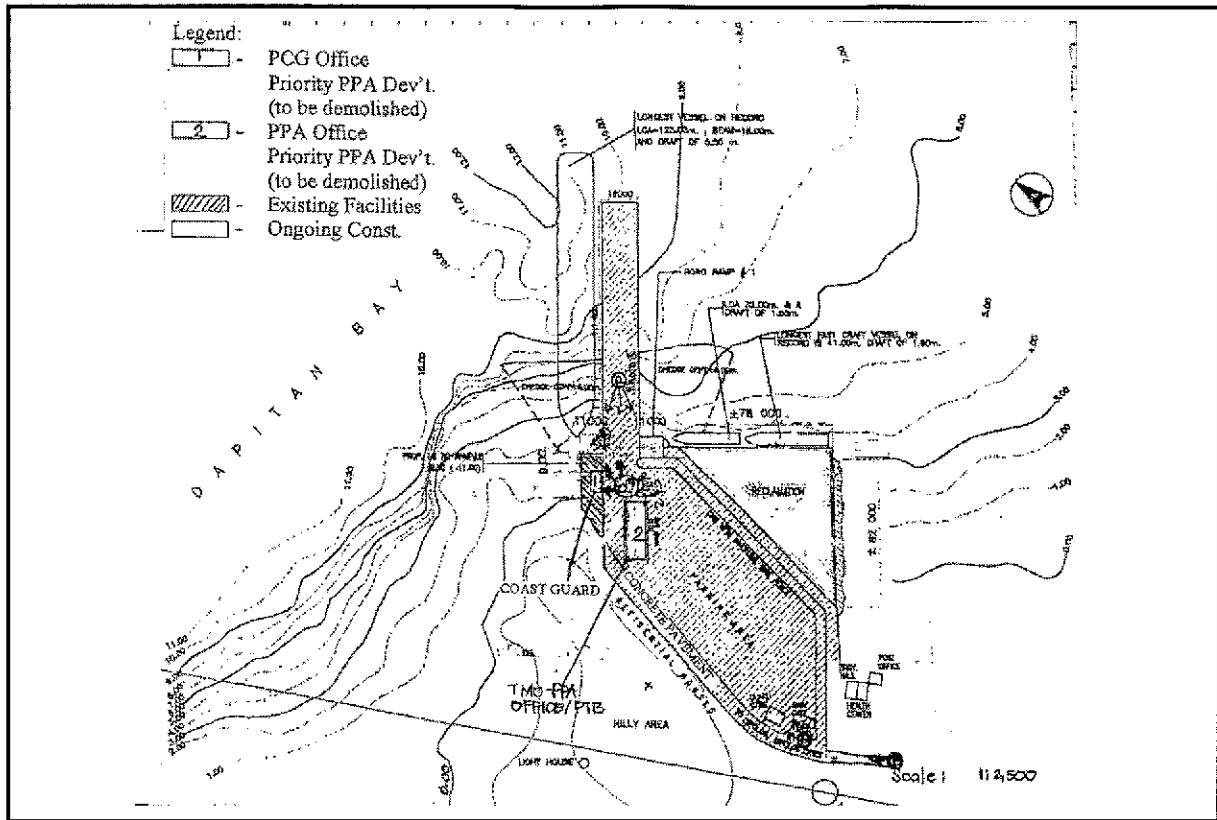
SITE LAYOUT FOR CGS DAPUTAN
